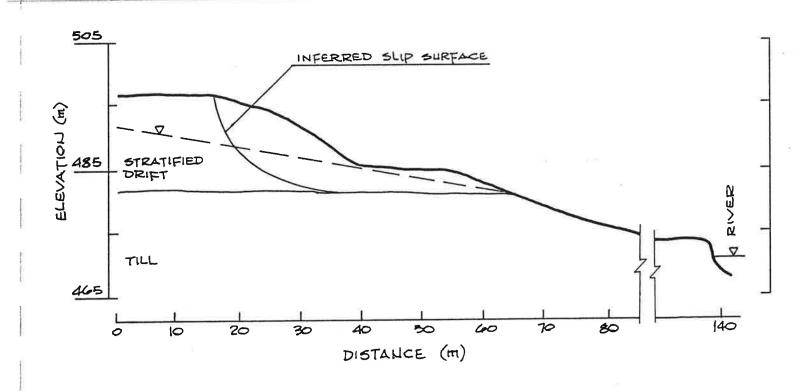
The 13th Street Cross Section Just North Of The Broadway Bridge
